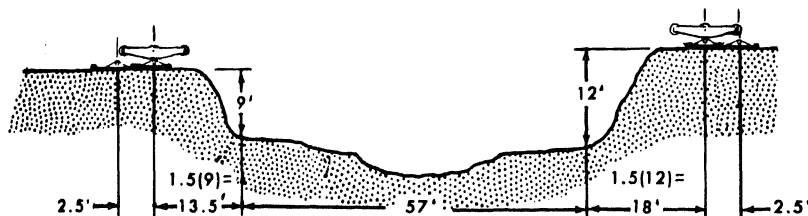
Profile of bridge site—both banks without prepared abutments.
